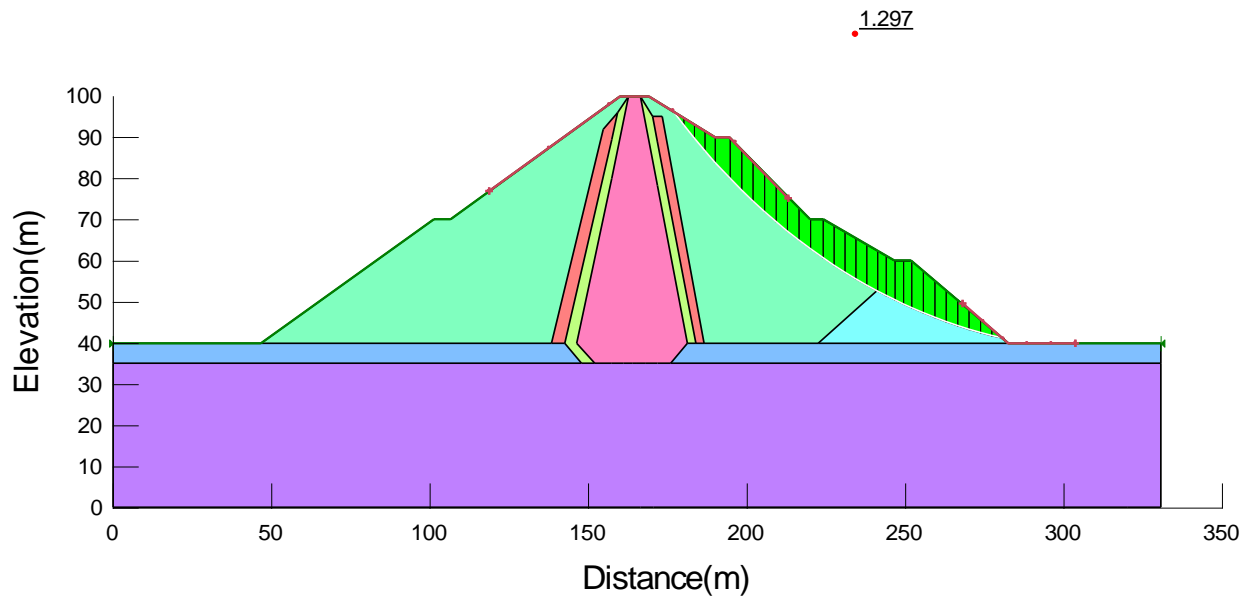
Slope Stability at end construction with earth quake CC (D/S)
